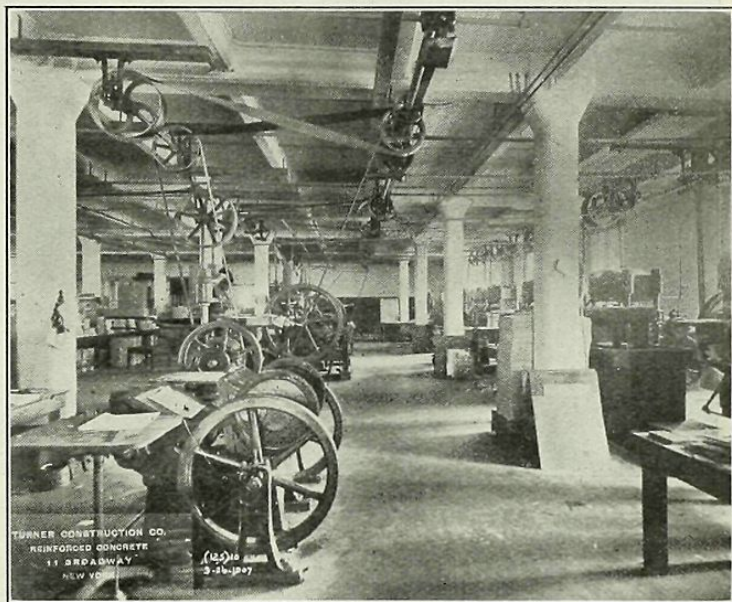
INTERIOR TYPICAL FLOOR OF ROBERT GAIR BUILDING.
